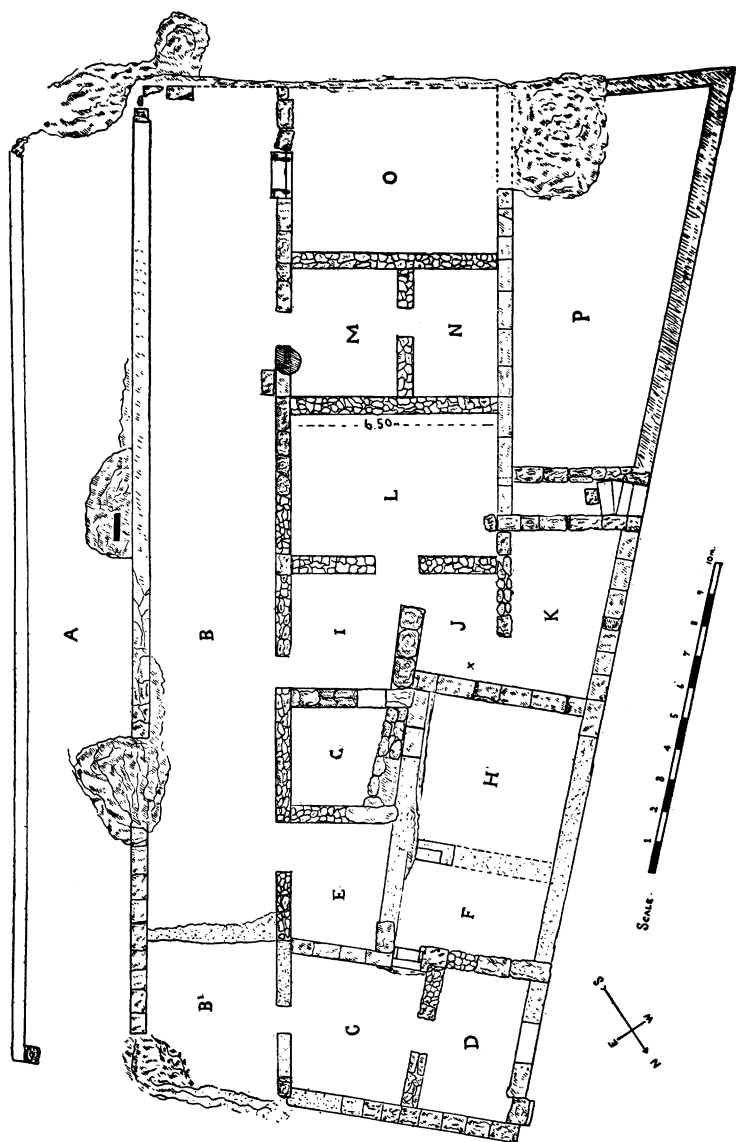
PLAN OF THE BUILDING ON THE HILL AT OENIADAE.
